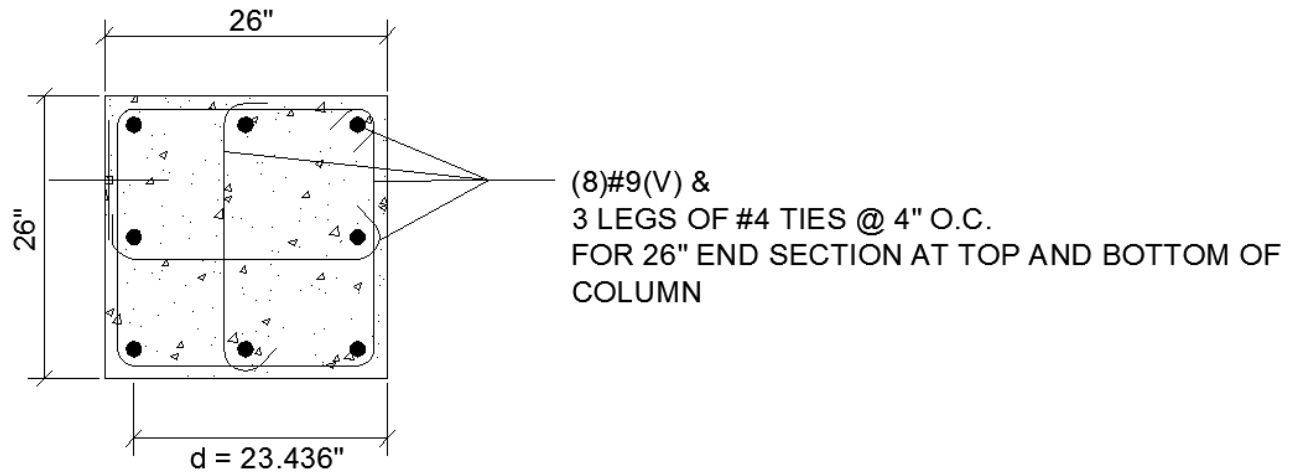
Exterior column, cross section at end of column at the 2nd floor level based on tsunami design requirements.
